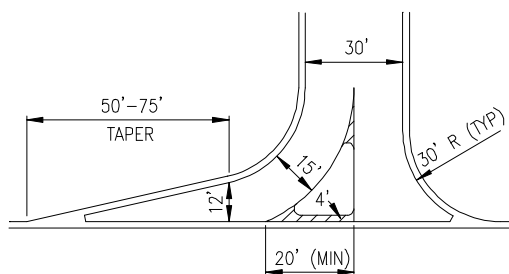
DETAIL C: TYPICAL TWO-WAY DRIVEWAY
